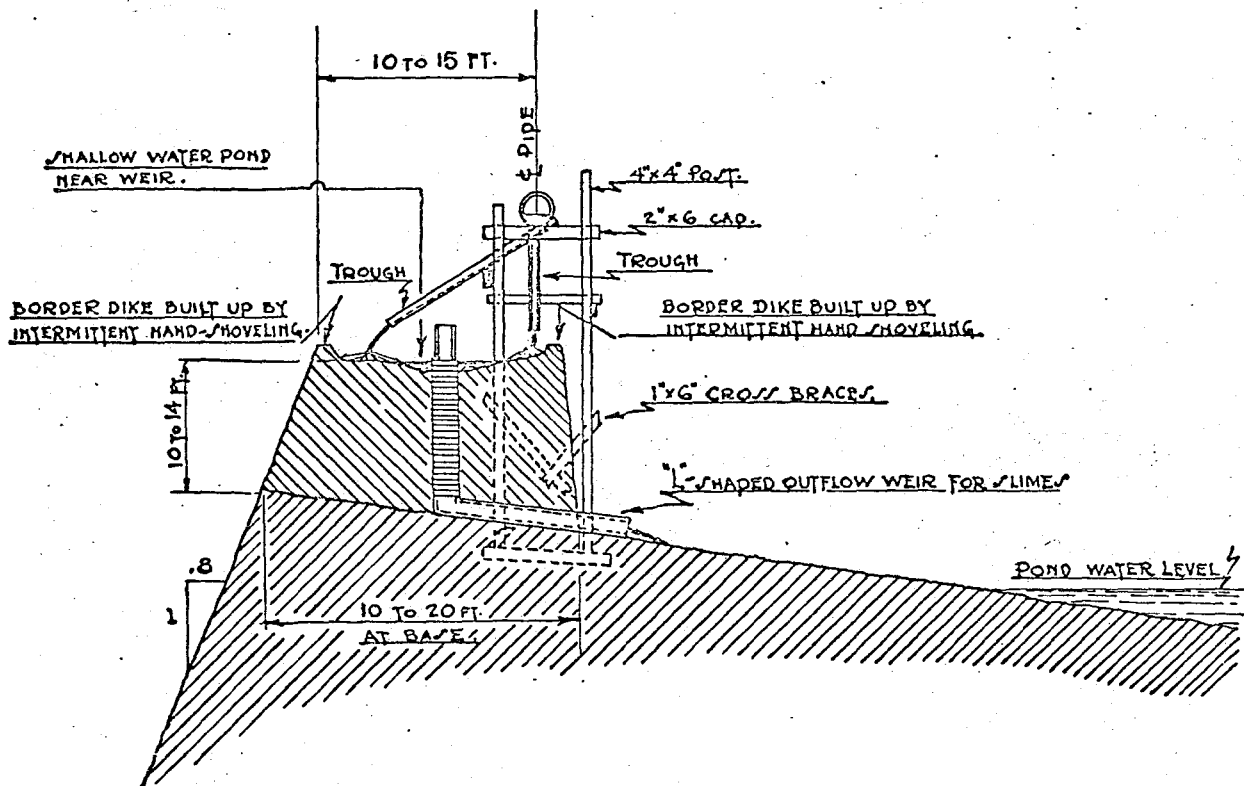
IDEALIZED SECTION OF TAILING-DISPOSAL AREA, ILLUSTRATING DOUBLE-DIKING METHOD OF PROVIDING STORAGE SPACE.
